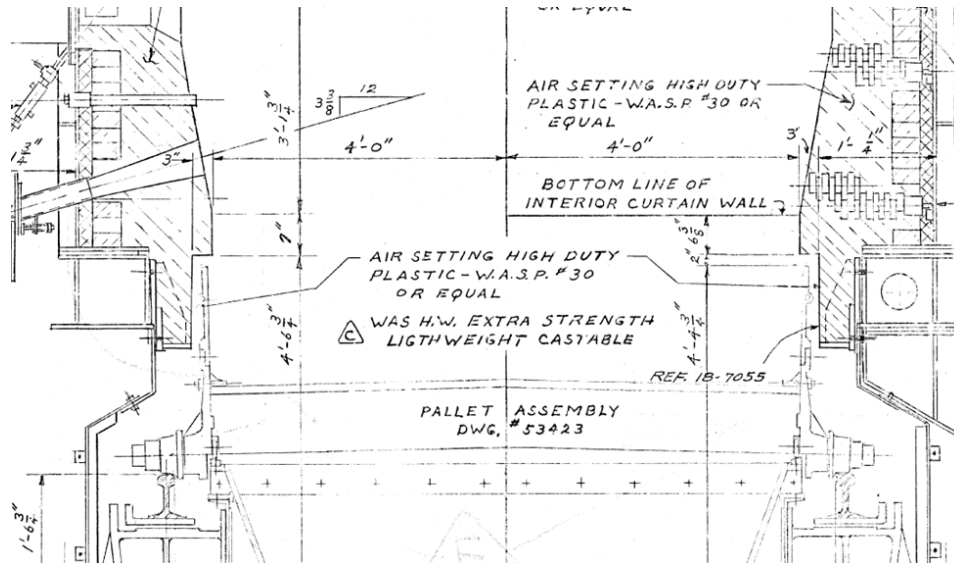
Close up of Drawing Cross Section of Original Design of Refractory Lining – Furnace No. 12
